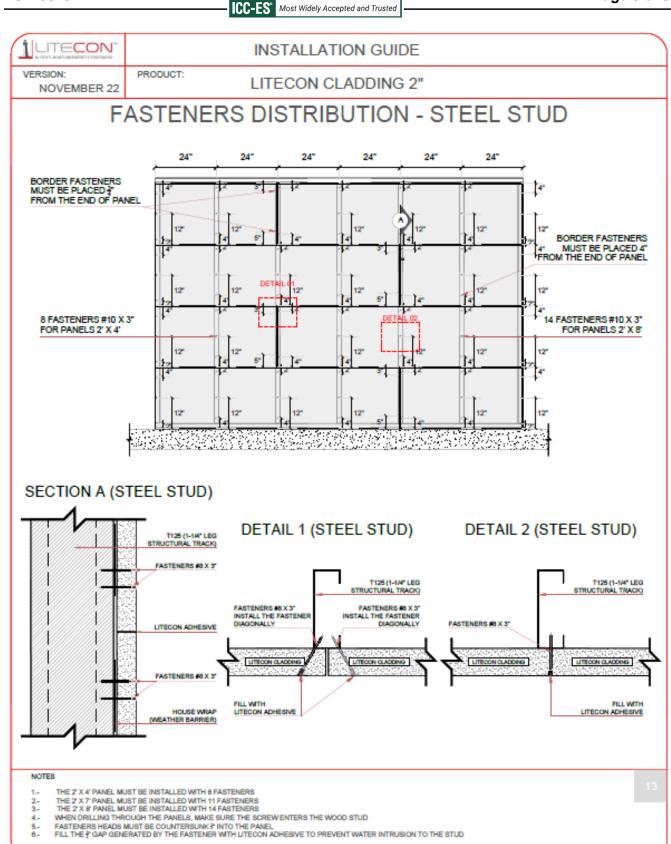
FASTENING DETAILS FOR STEEL FRAMED ASSEMBLIES
